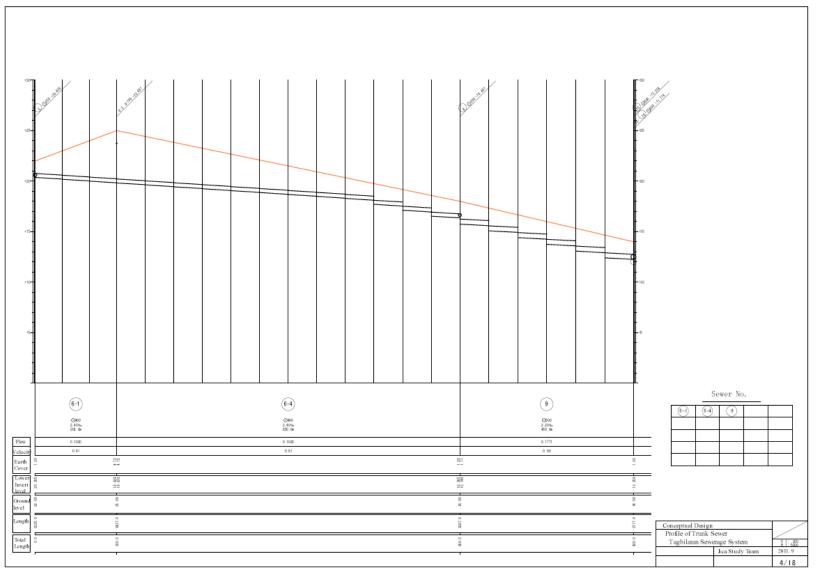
Profile of Trunk Sewer (Tagbilaran Sewerage System)
